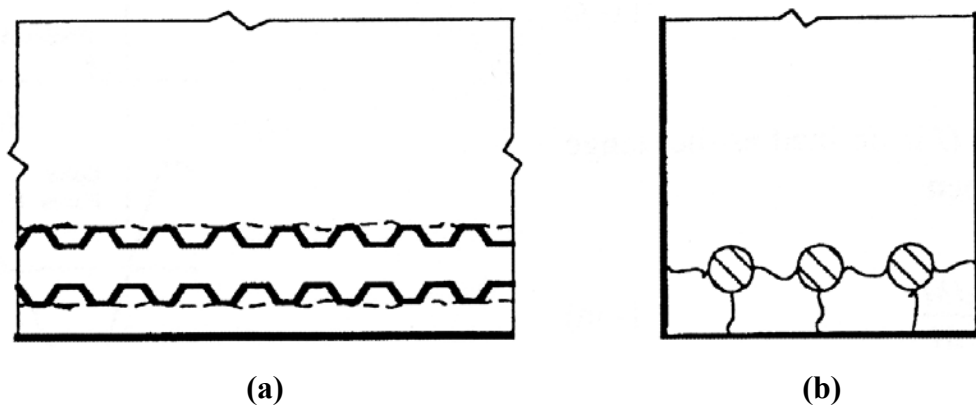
Modes of bond failure: (a) local concrete crushing or shear cracking in a pullout failure and (b) splitting crack planes [adapted from ACI 408R-03]
